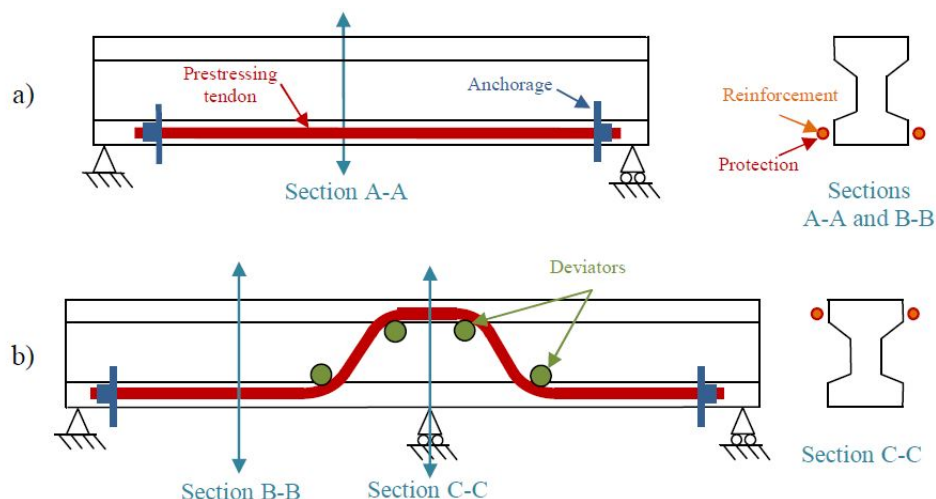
Sketch of the principle of external prestressing on a) simply supported beams b) continuous beams
